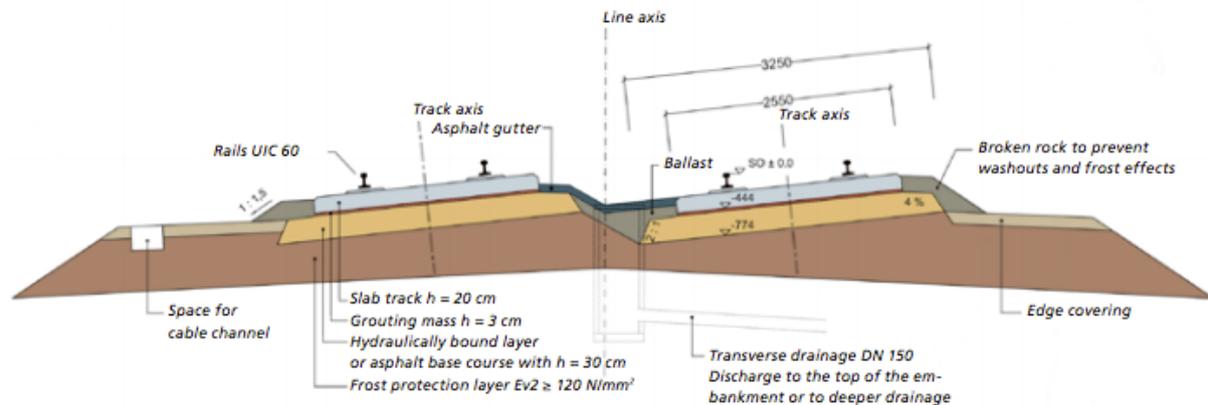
Typical cross-section for a Bögl slab track on an earth structure (Max Bögl).
